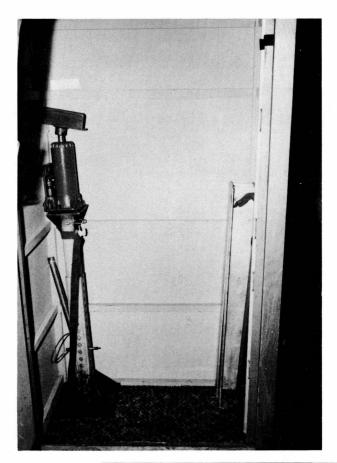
Utility jack, level, wrecking bar, and engine ways are stowed just inside front door.
